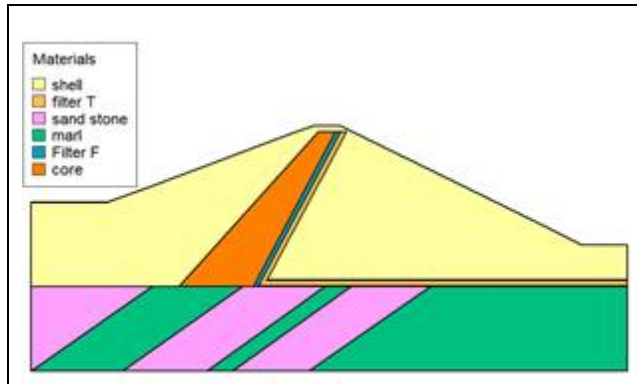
Typical Cross Section of the Al Adhaim Dam
